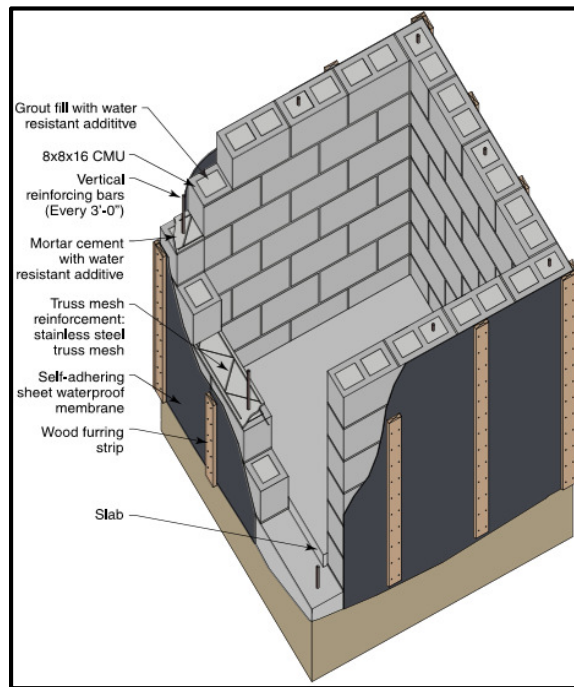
CMU Wall System (source: FEMA Homeowner's Guide to Retrofitting)
